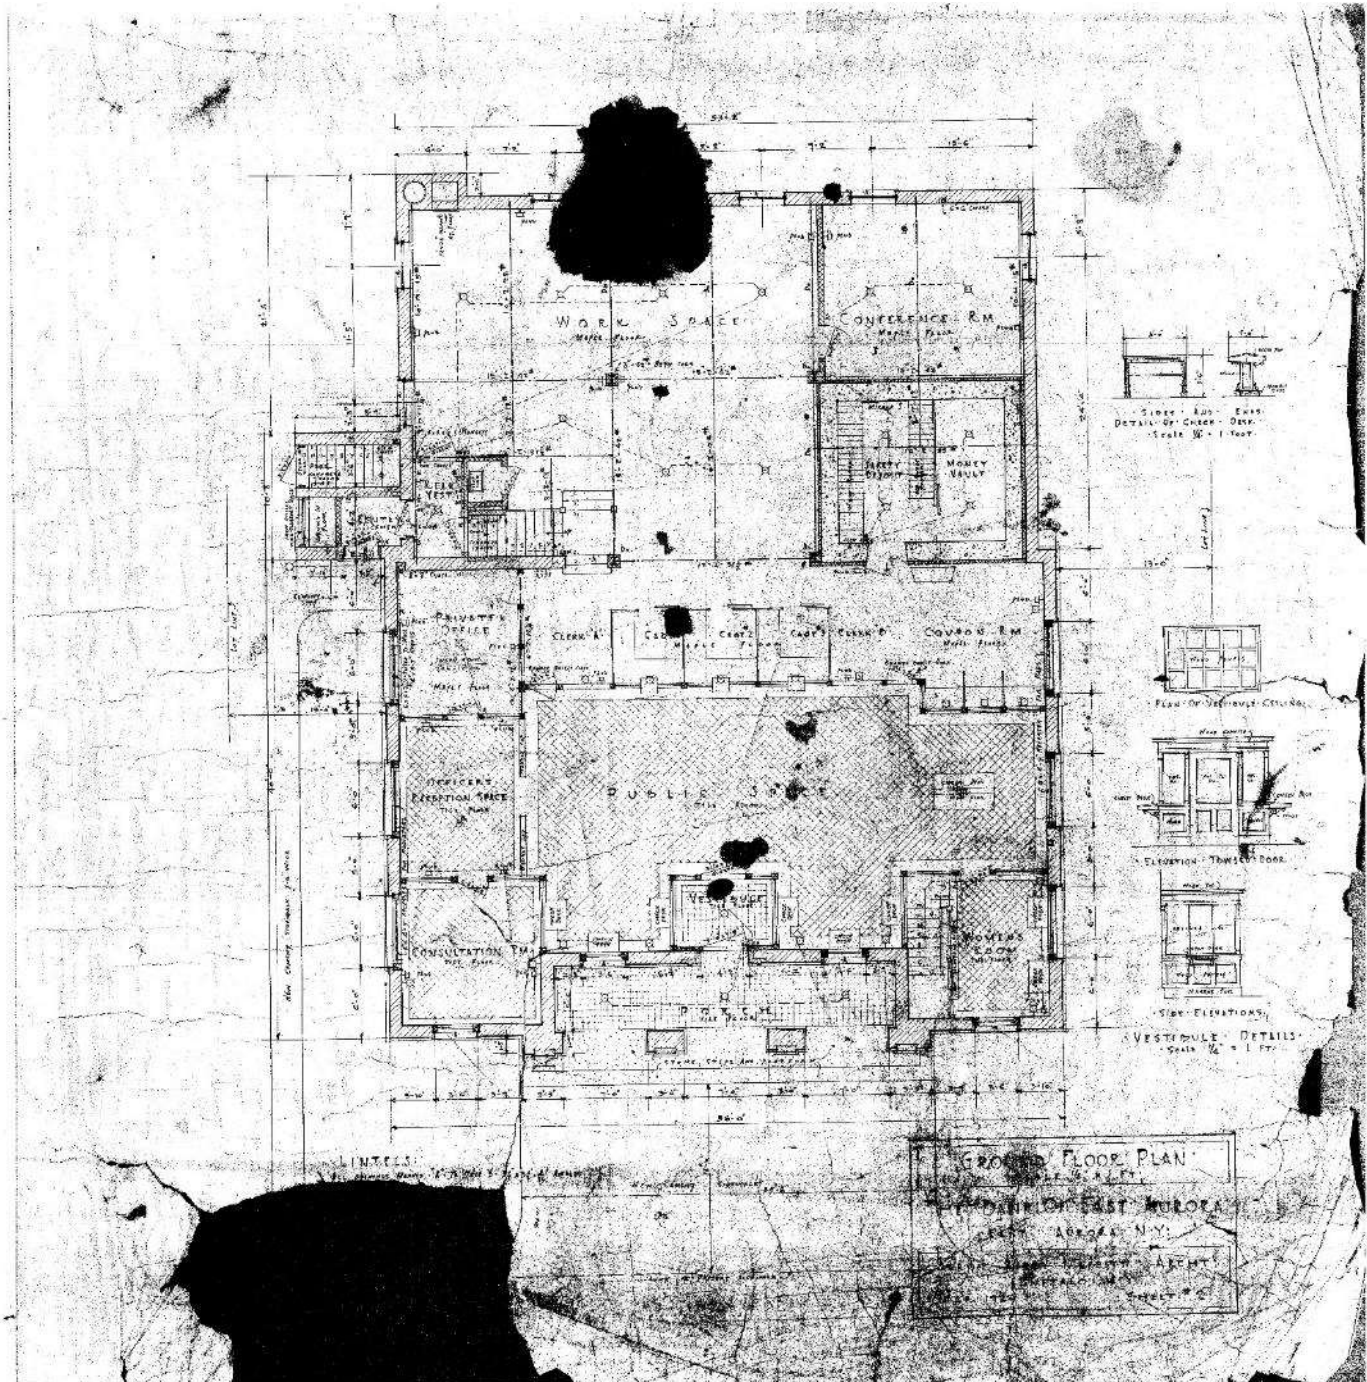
Original Ground Floor Plan by Aaron Riley Merritt
